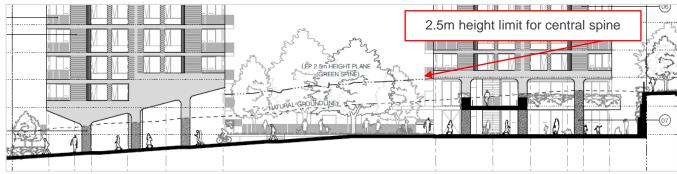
Extract of east-west elevation with 2.5m height limit shown red (Source: Silvester Fuller)
